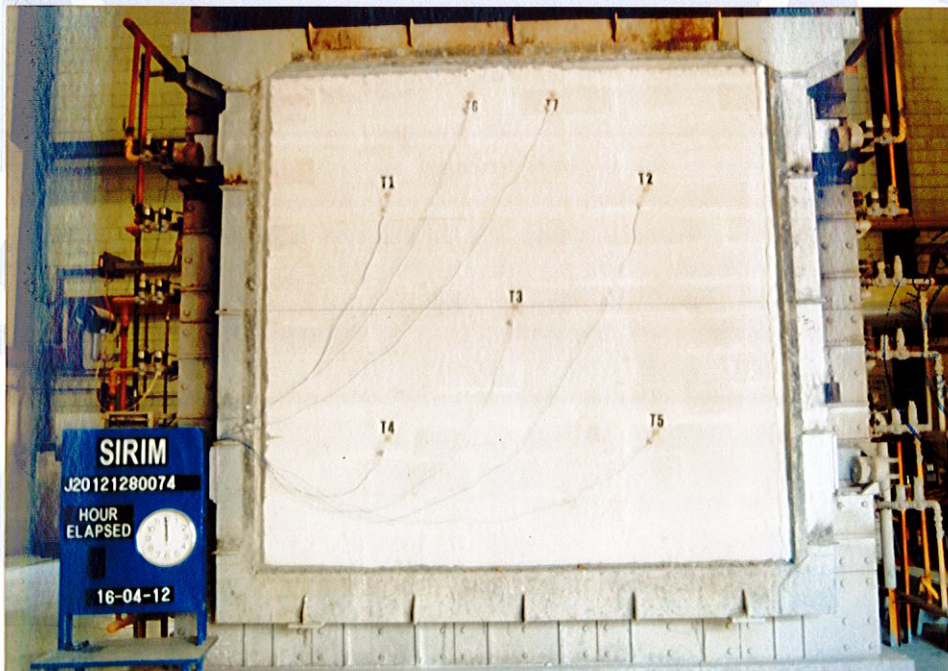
The unexposed face of the AAC block wall partition system before the test
